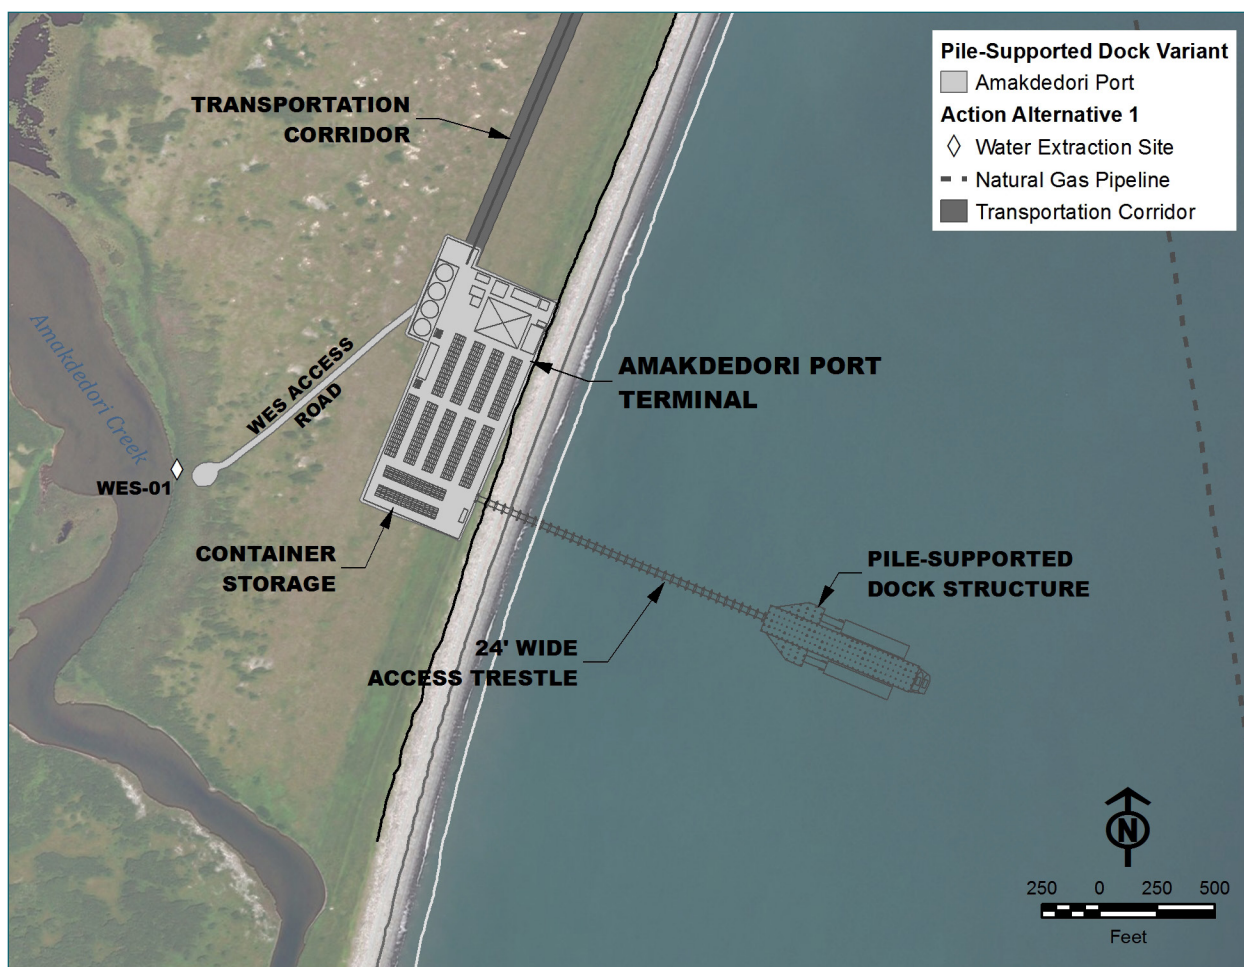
Action Alternative 1 - Amakdedori Port Pile-Supported Dock Variant
